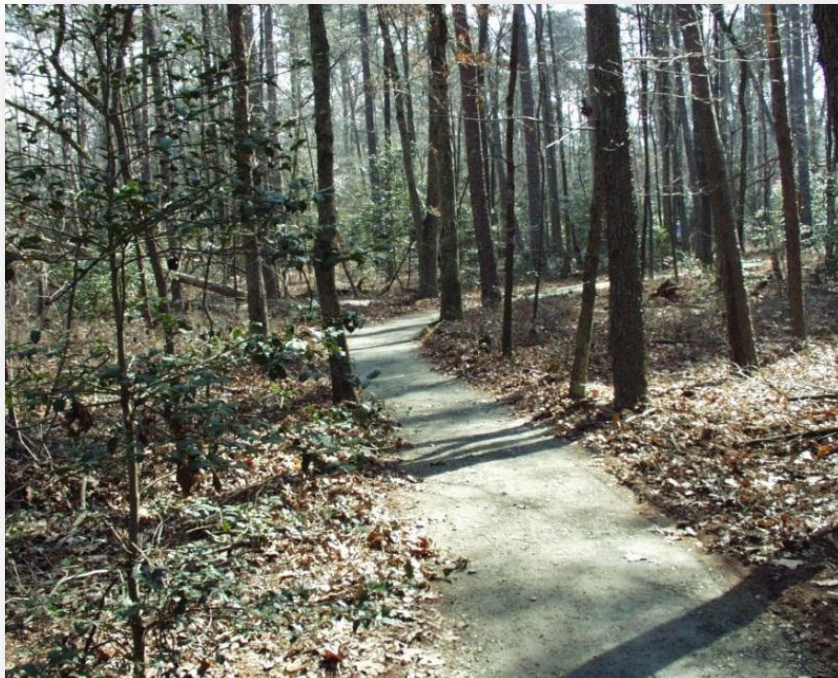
this section of the Junction & Breakwater Trail, located adjacent to Holland Glade Road north of Rehoboth Beach, is constructed of stone with fines surface.
